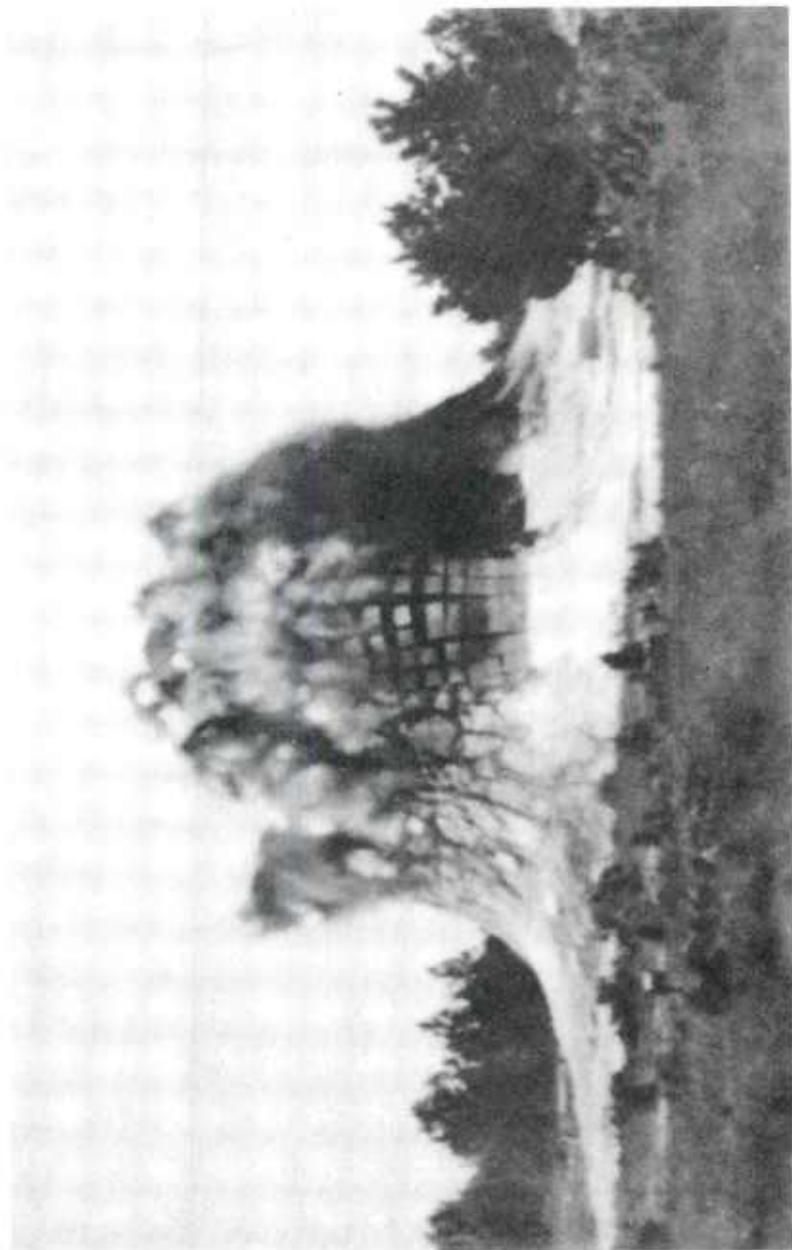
Early stage of venting of 12 MS event detonation, showing separation and lofting of runway pavement over crater area and initial upheaval of runway beyond crater edge.
